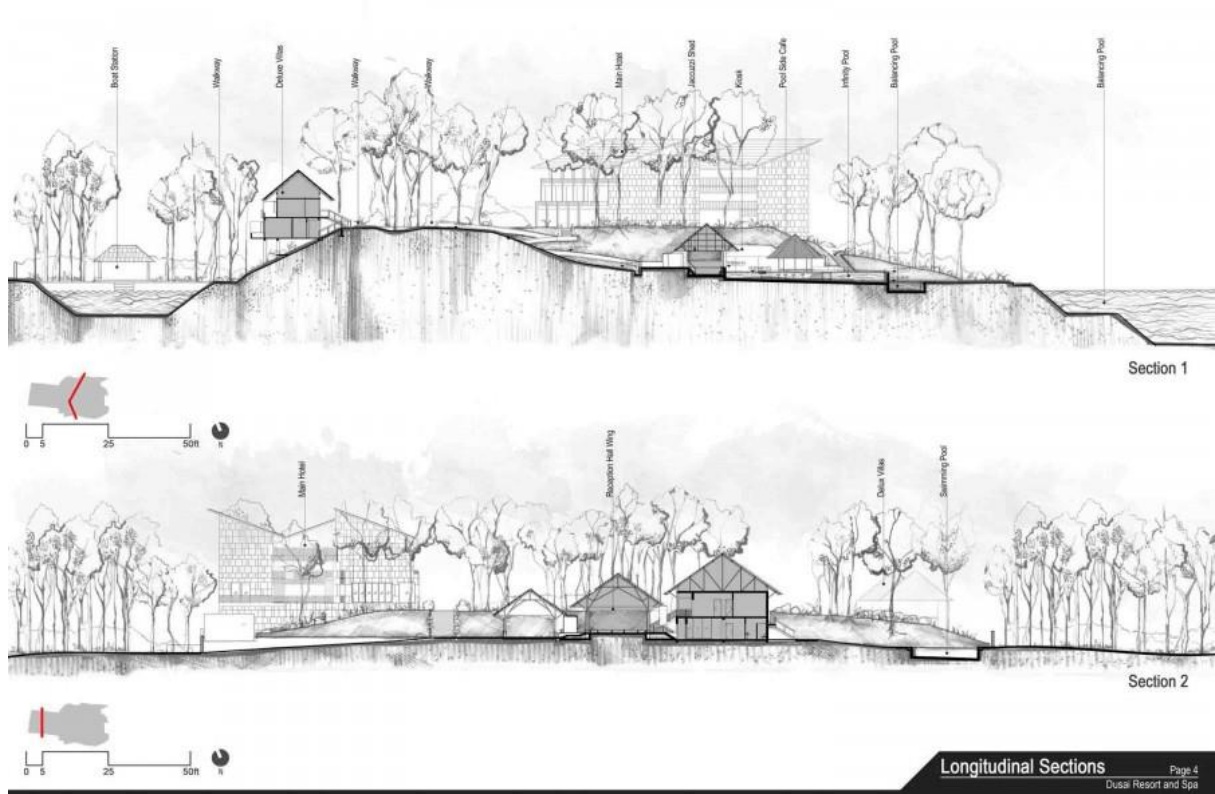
Longitudinal sections, Dusai resort & spa | source: archello
